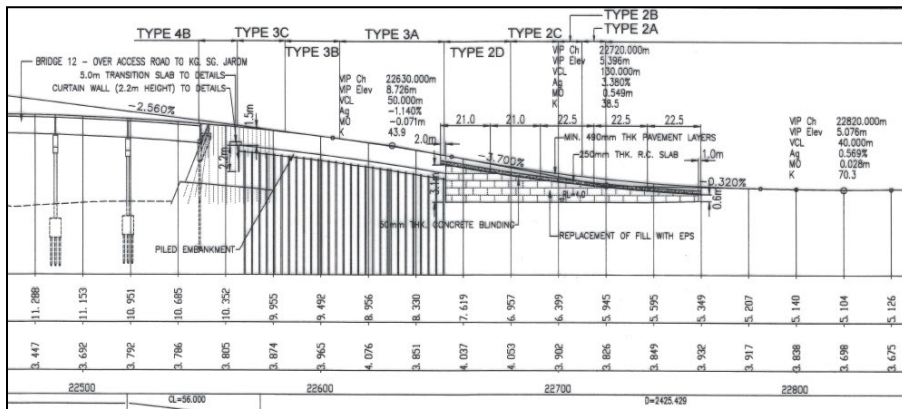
Full section and ground treatment for bridge approach. (Courtesy of SKVE Holdings Sdn. Bhd.)
